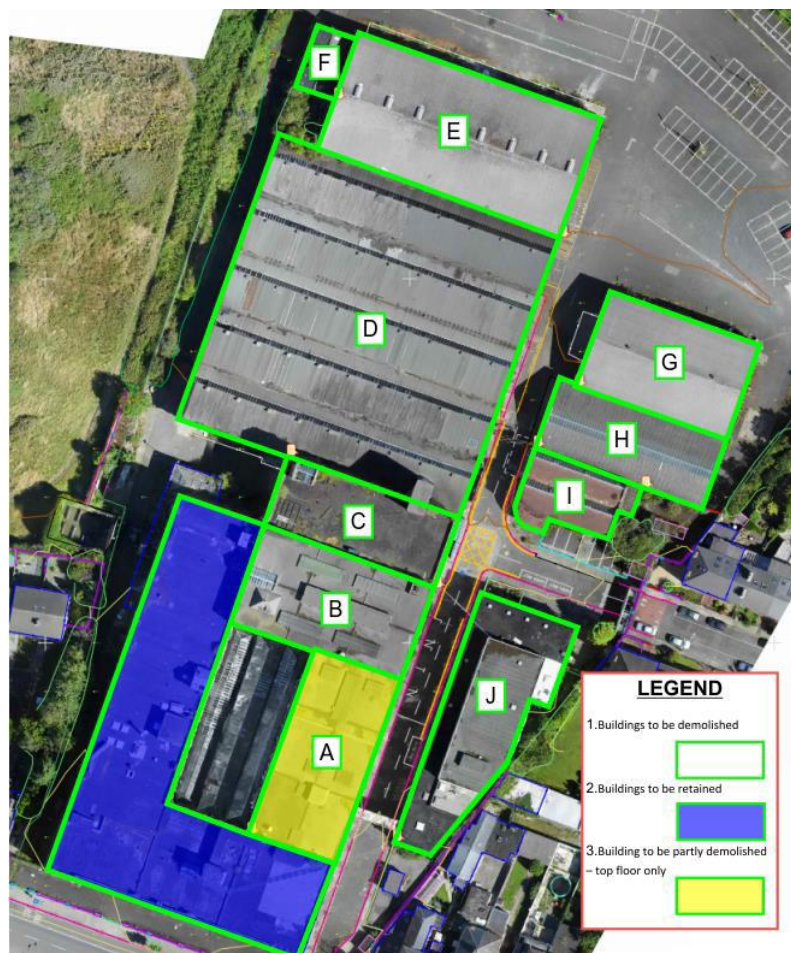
EXISTING BUILDINGS & EXTENT OF PROPOSED DEMOLITION
